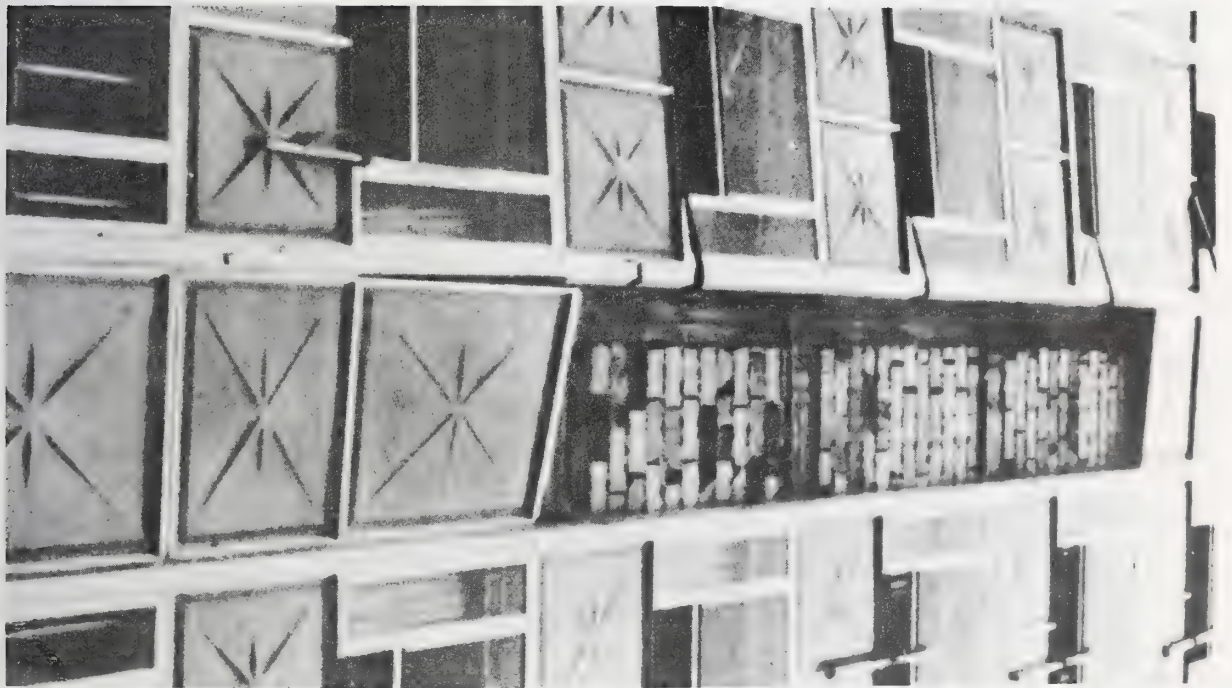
Wall Damage due to Local Wind Pressure
